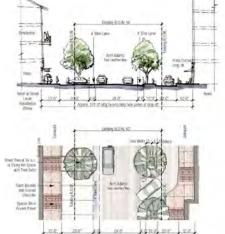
Street section: 2 traffic lanes, 2 bike lanes, head-in parking, slip drive (Source: JHP, 2009)
